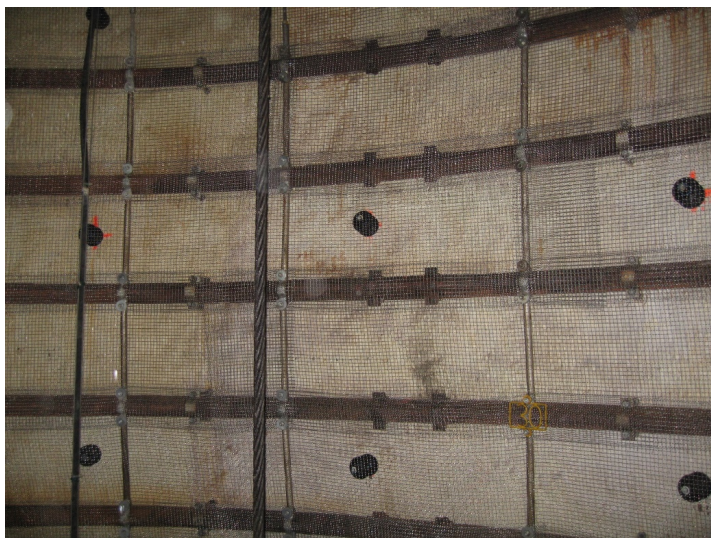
The support protecting the shaft excavation over the salt deposit section
